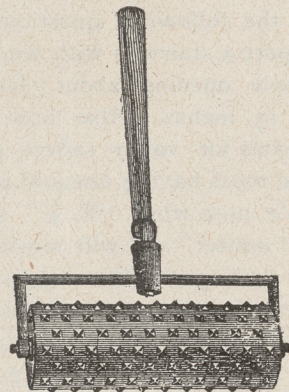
ROLLER USED IN FINISHING SURFACE.
